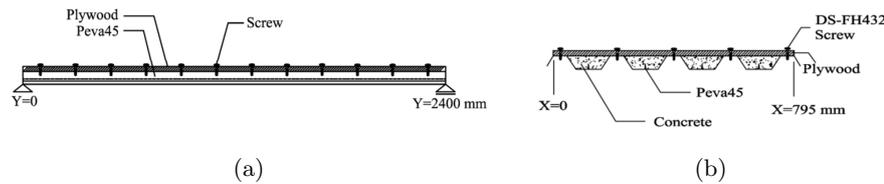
Structural model of the PSSDBC system (a) Longitudinal section (b) Transverse section.
